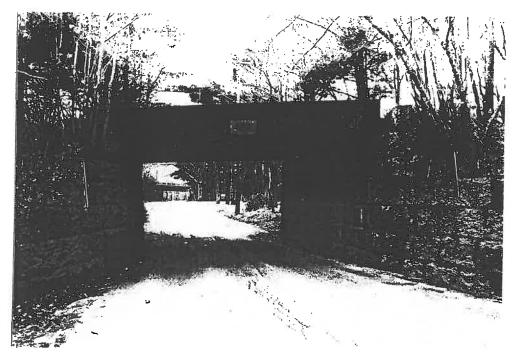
description: Half Thru Plate Girder Bridge over Drakeside Road, Hampton (46.02)
